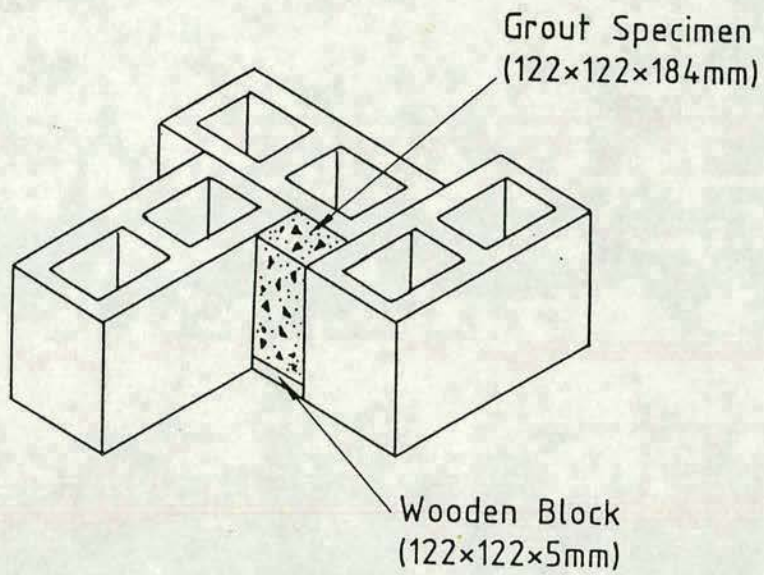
Illustration of block moulded concrete infill specimen fabrication.
